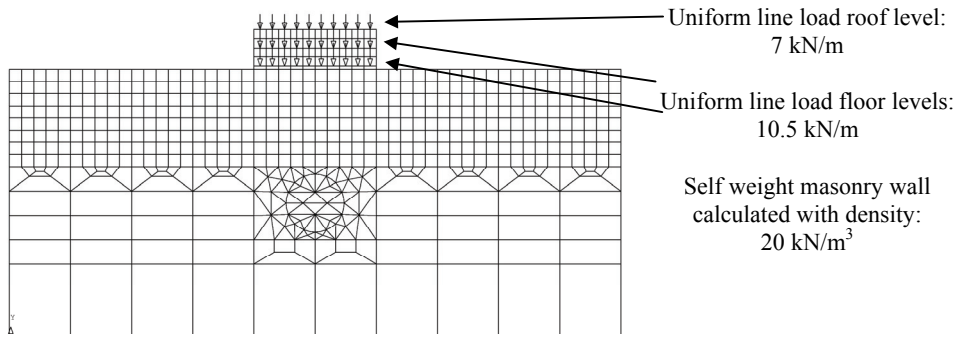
Loading scheme massive masonry bearing wall for the example of $L/H=3$
